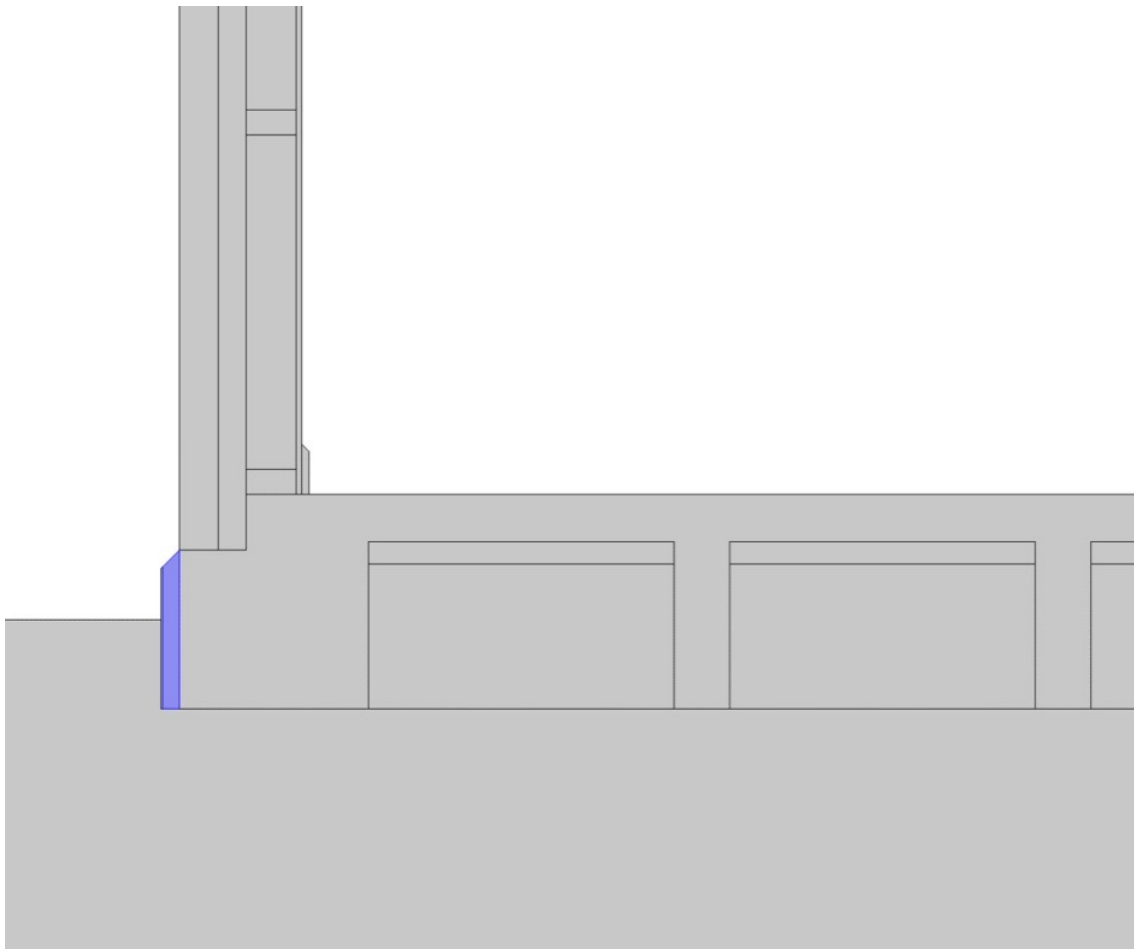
Configuration C: A waffle pod foundation, timber-framed wall and brick veneer cladding, with perimeter insulation added to the exterior side face of the slab.
